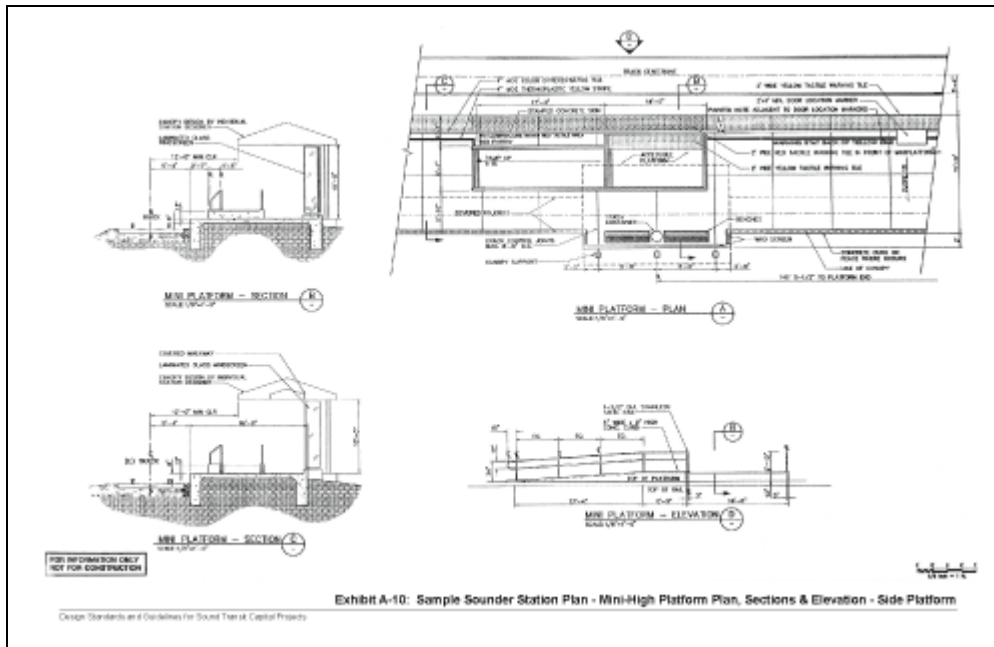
Sample Sounder Station Plan – Mini-High Platform Plan, Sections & Elevation – Side Platform (1.4 MB)
